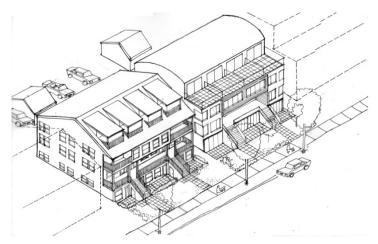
Multiple unit (four or more) stacked townhouse on assembled site or large lot
